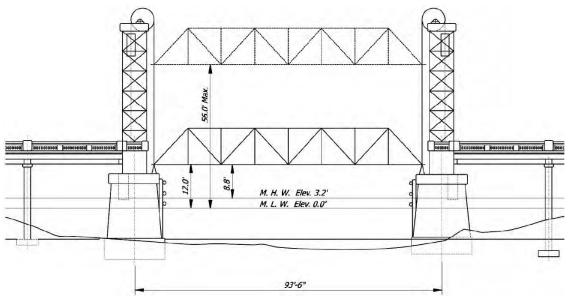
Bridge elevation view for a vertical lift bridge indicating vertical clearances. (Source: Florida DOT)
